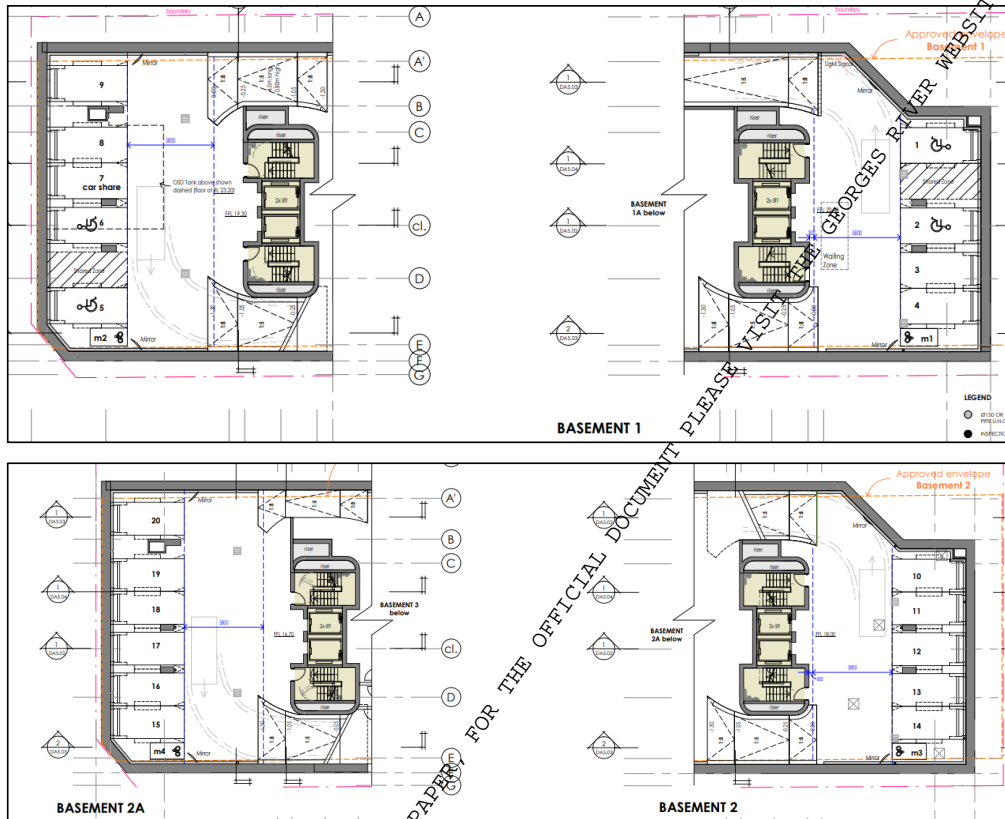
Proposed Basement Plans showing proposed parking (Source DA3.01 JSA Studio)
